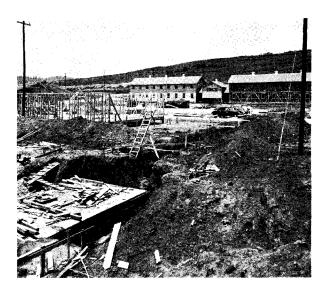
Construction of the west dormitory is shown at right background. The wall framing for the cafeteria is being erected; a septic tank is being installed in foreground.
